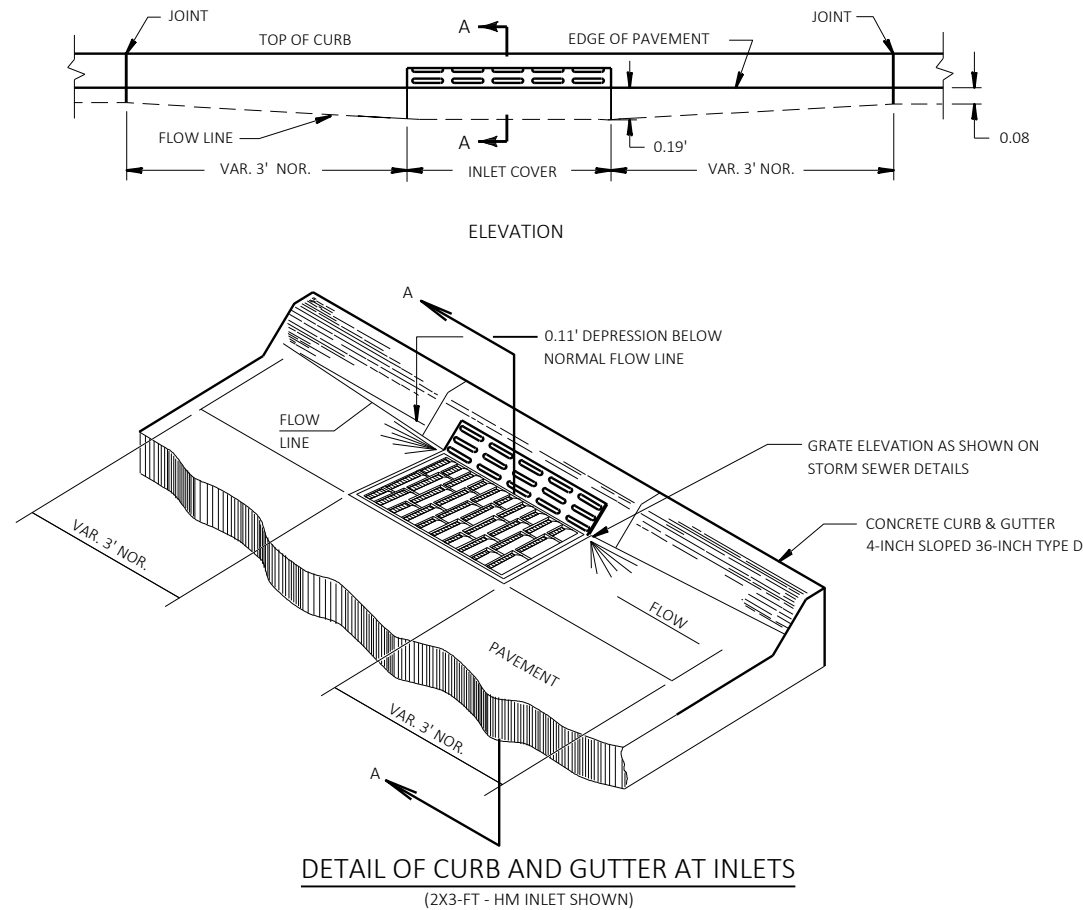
DETAIL OF CONCRETE CURB & GUTTER 36-INCH TYPE R AT INLETS
